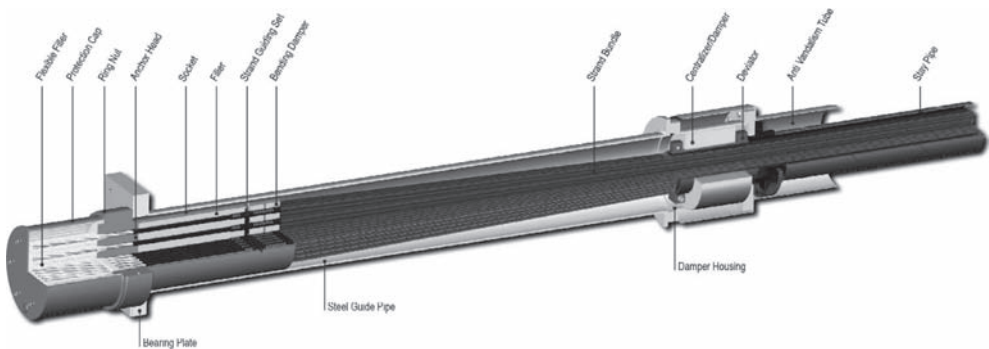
BBR High Am Cona (BBR/VT) anchorage details.
